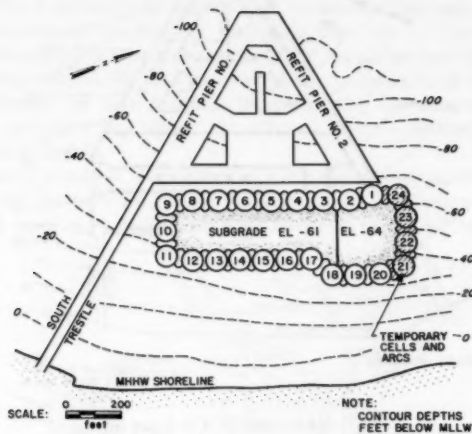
Cofferdam Plan (1 ft = 0.305 m)
